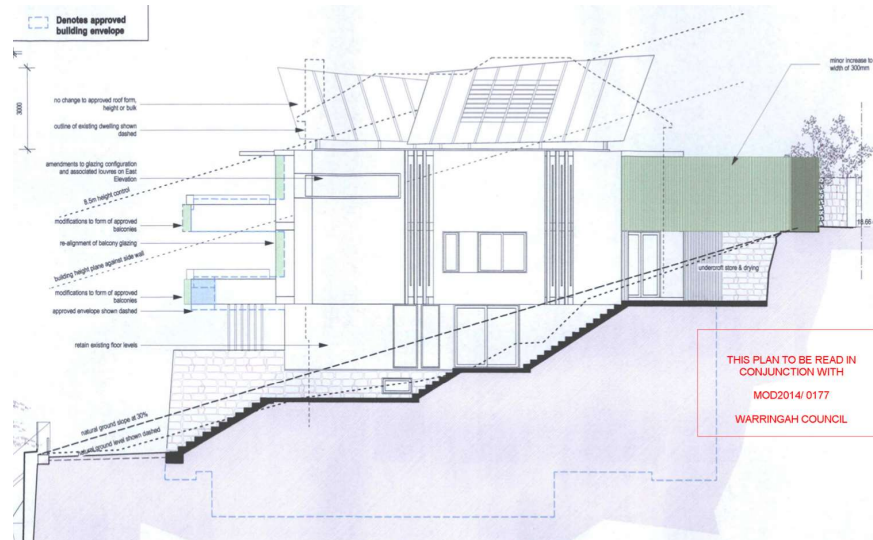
Eastern elevation of development approved pursuant to DA2011/0301, as modified
